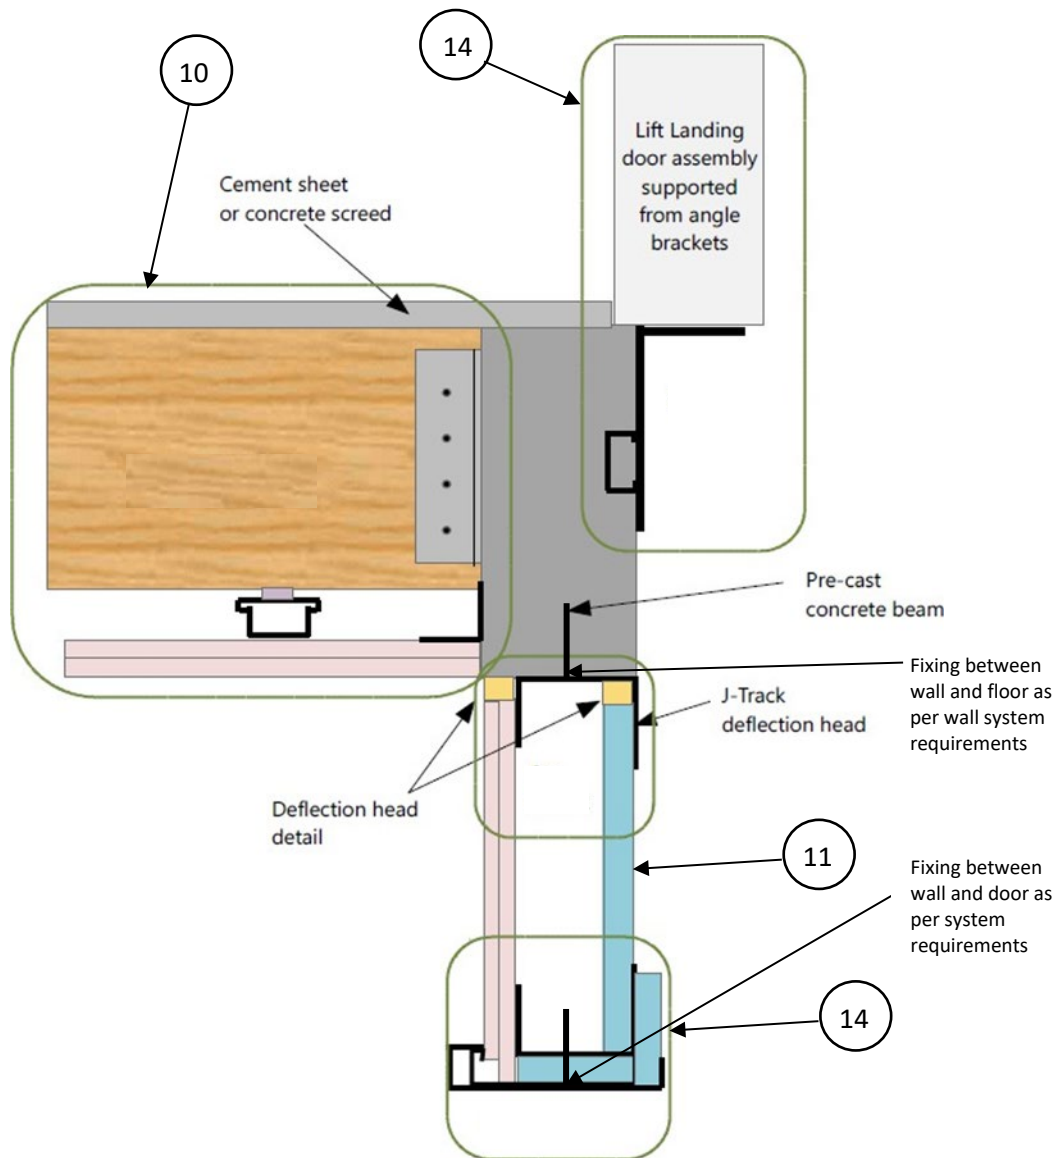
Head and sill detail for pre-cast concrete and shaft wall interface – Section view
